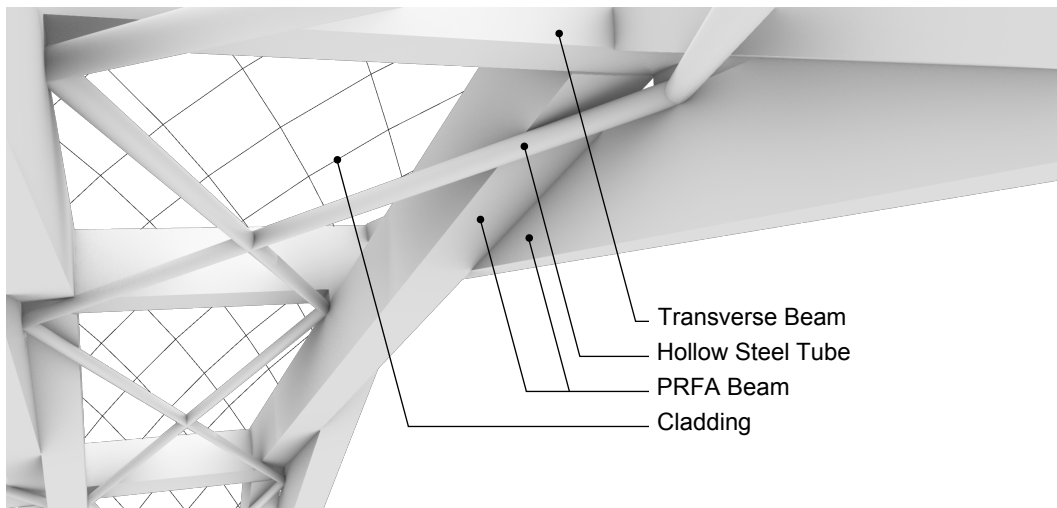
Conceptualization of a Steel Tube Truss Bracing
